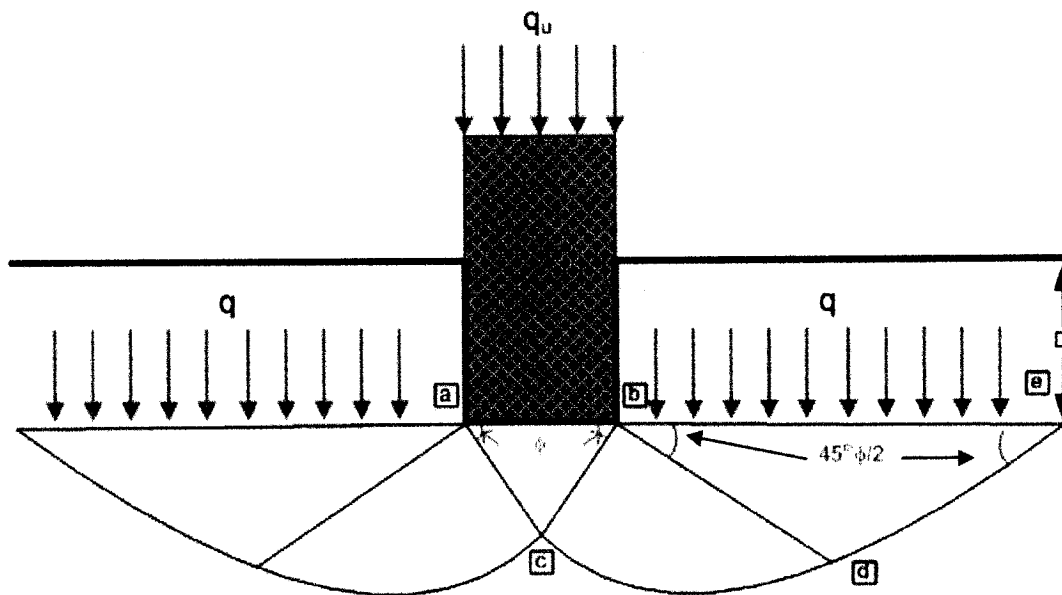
Failure plane of Terzaghi's Theory for Shallow Foundation
